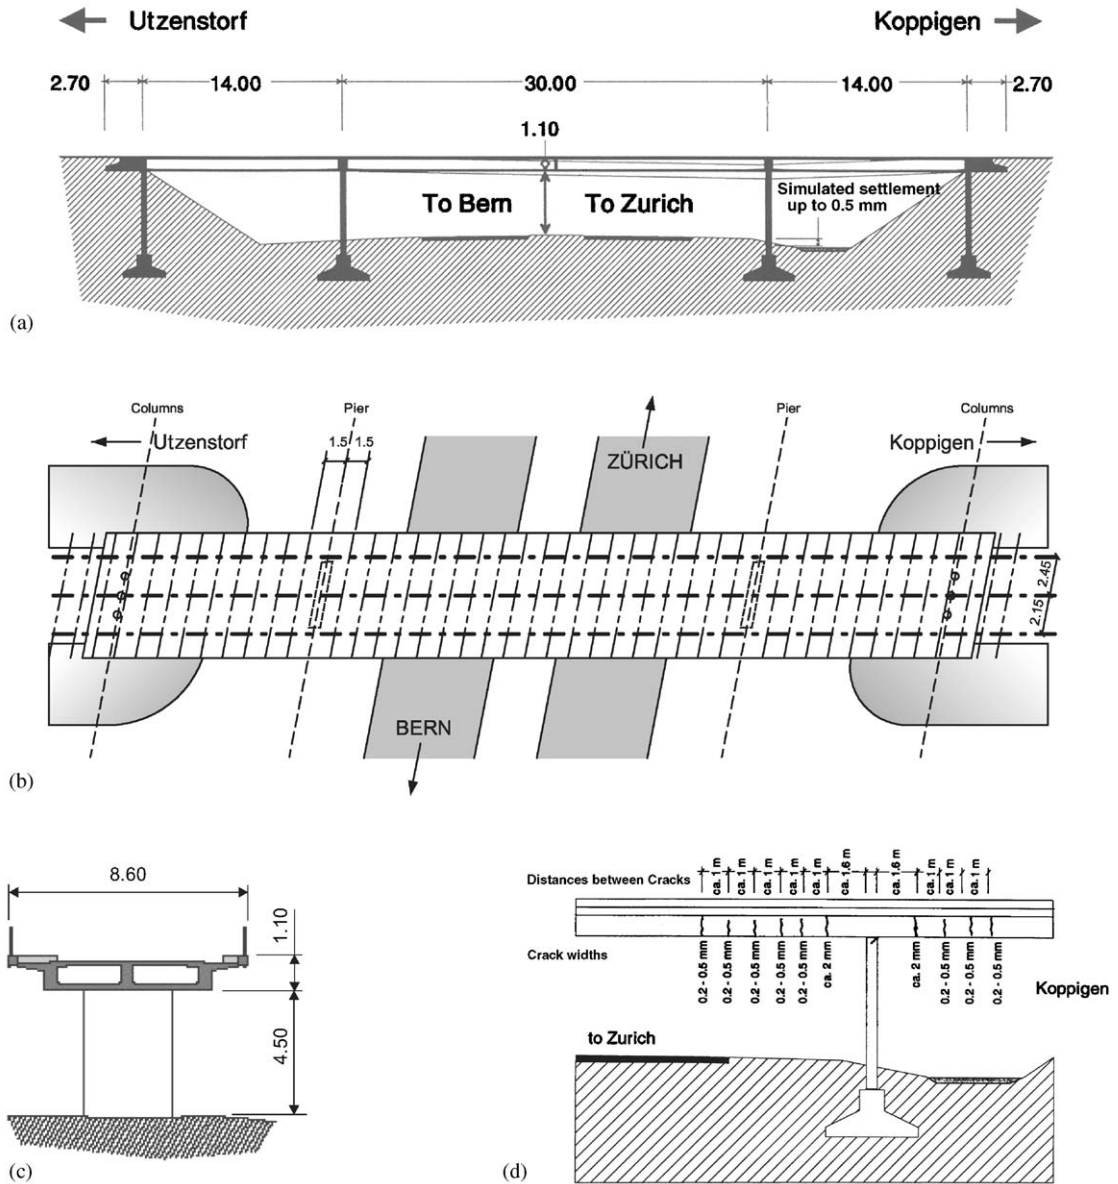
Highway bridge Z24, Switzerland: (a) Elevation, (b) top view with measurement grid indicated and (c) cross-section of the bridge. (d) Cracks in the bridge girder, above the lowered pier (at 44 m).
